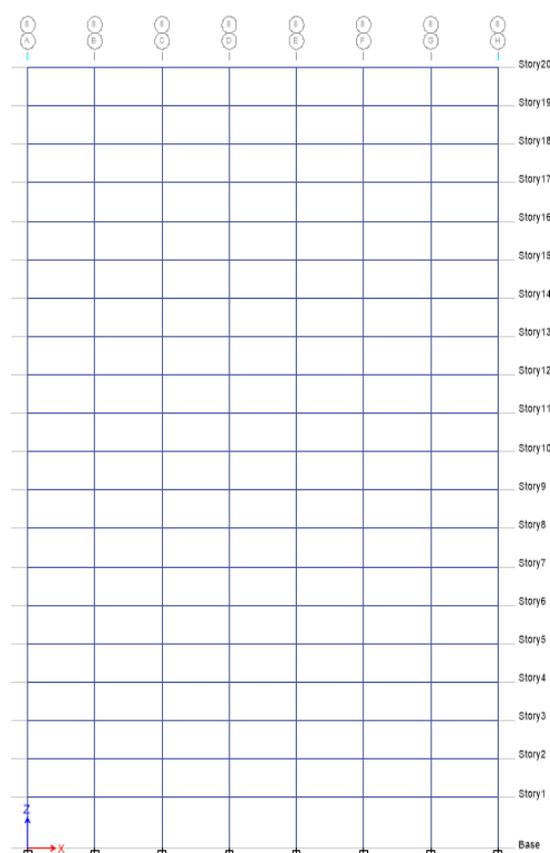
(a) MODEL – 1 Base Model Elevation View
